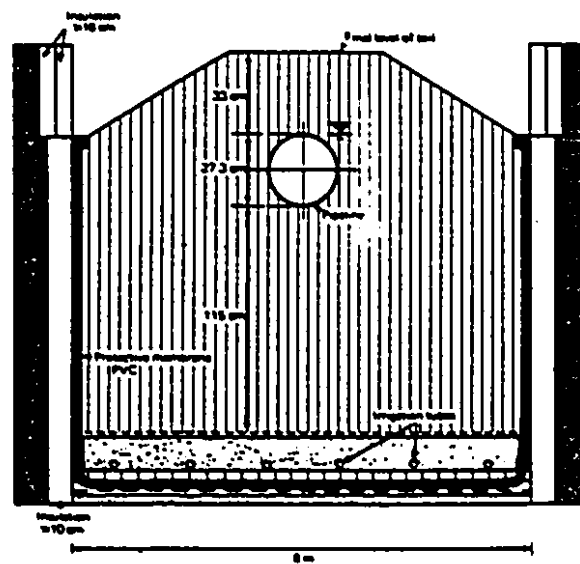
Transverse section of Caen test facility (after Dallimore et al. 1984)
